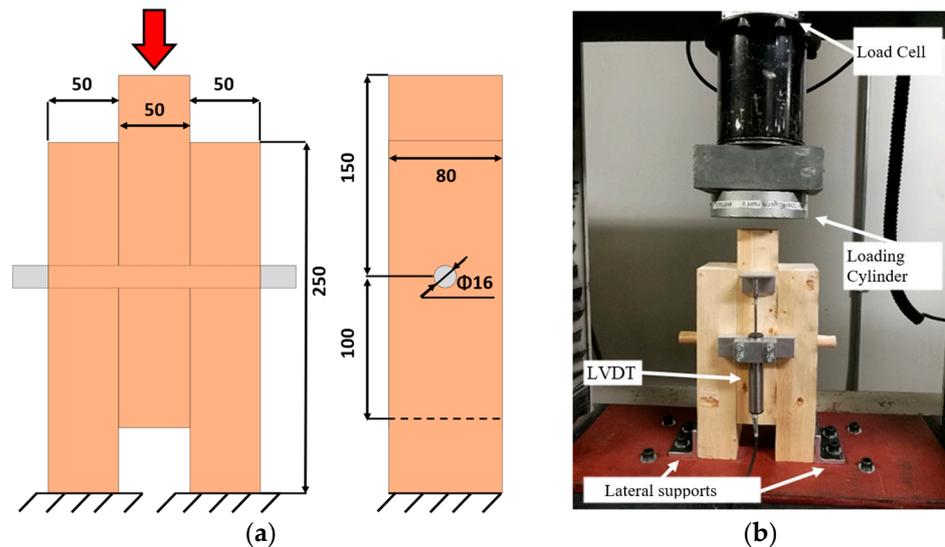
The push-out shear test: (a) geometrical description and (b) experimental set-up.
